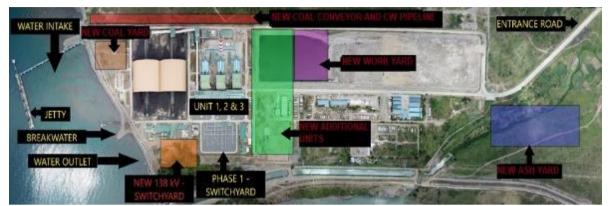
Proposed Layout/Footprints of Project Facilities
